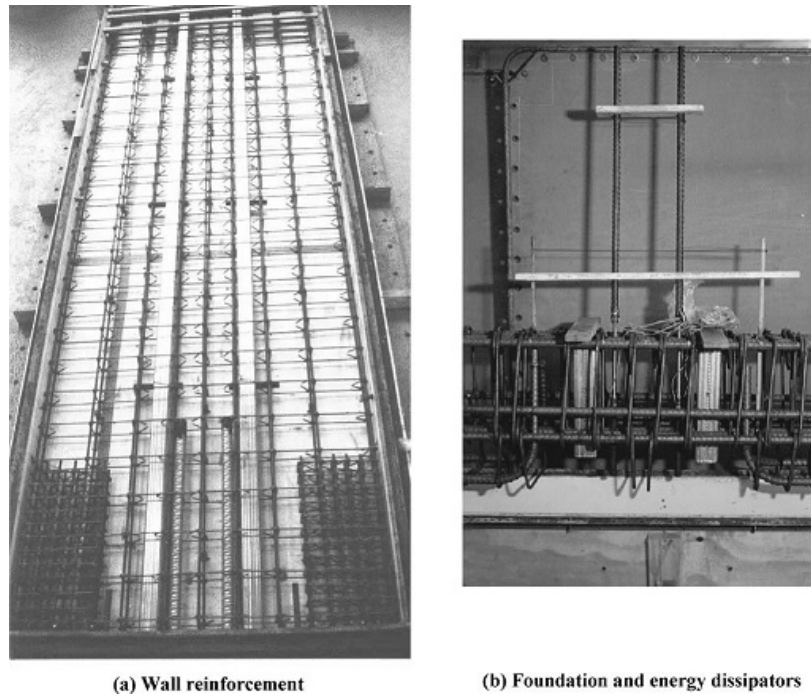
Reinforcement details of one wall specimen prior to casting of concrete (from Restrepo and Rahman 2007)
